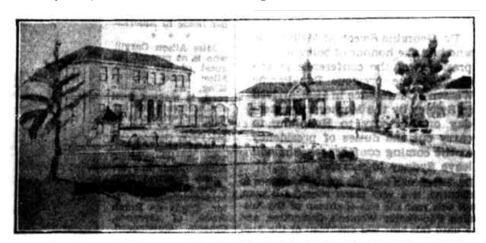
Golf House at Woollahra Park, Rose Bay, as it will appear when completed. 'Woollahra. New Golf House,' *The Sydney Morning Herald*, 26 June, 1934.
